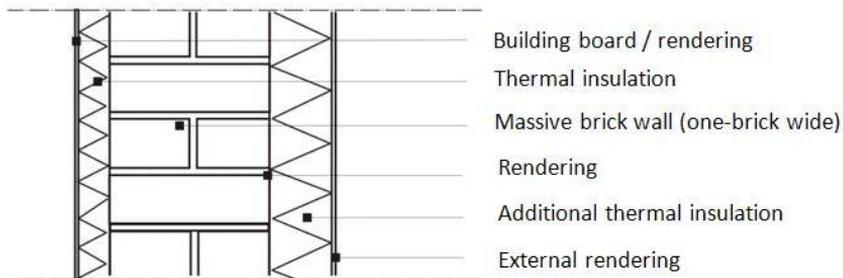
Massive brick wall with internal insulation. Original structure and renovation with additional thermal insulation.
